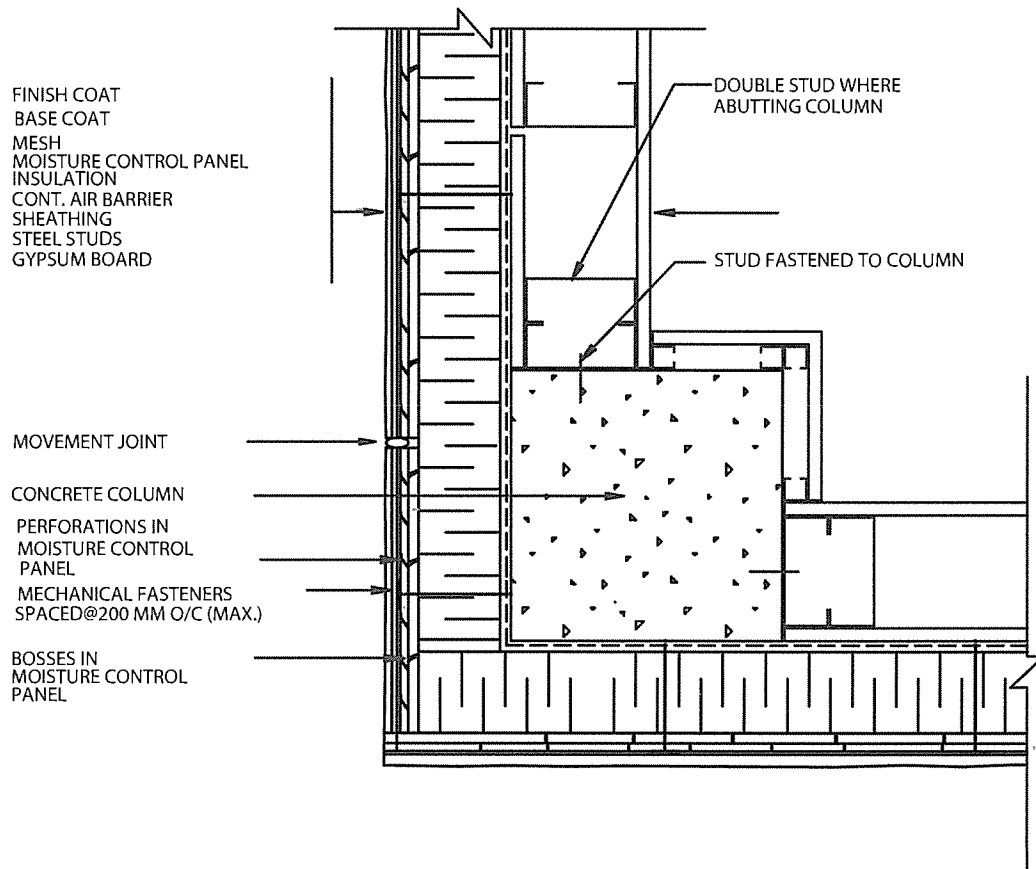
ACRYLIC STUCCO / STEEL STUD
